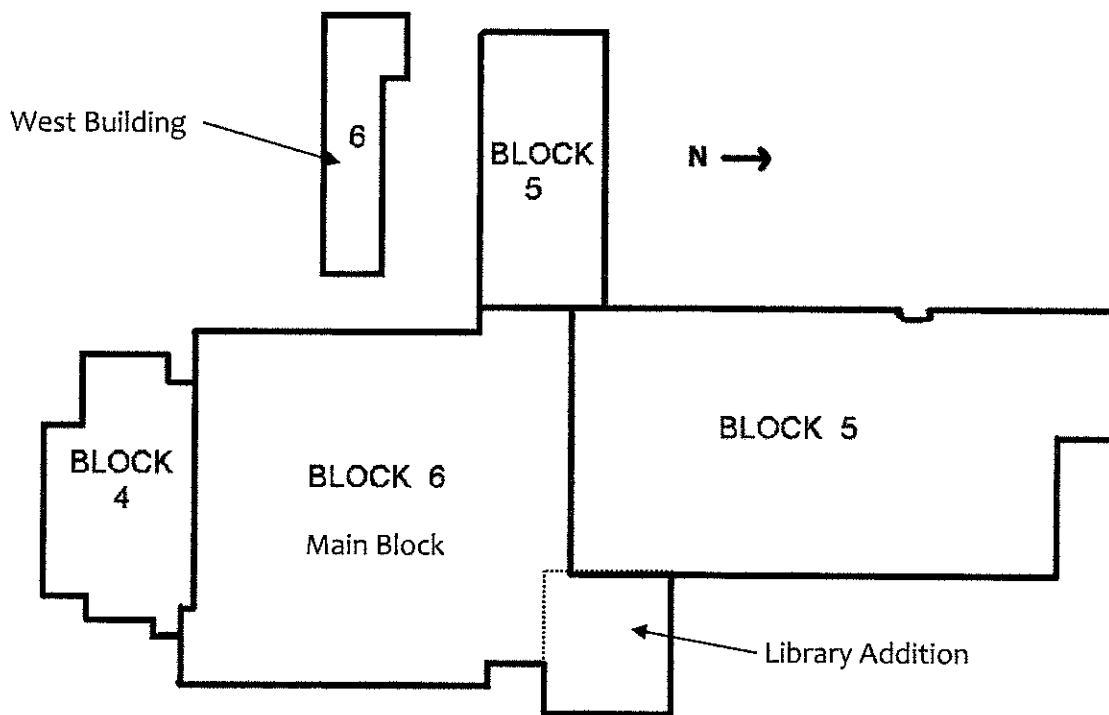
Key Plan for Burnaby North (South "Kensington" Building)
